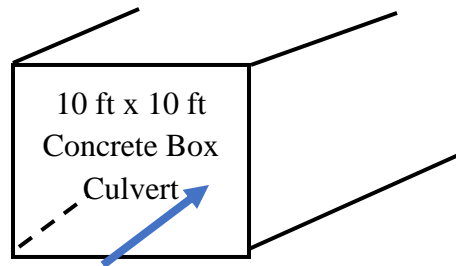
Looking at the entrance of 10 by 10-foot Concrete Box Culvert (CBC)
